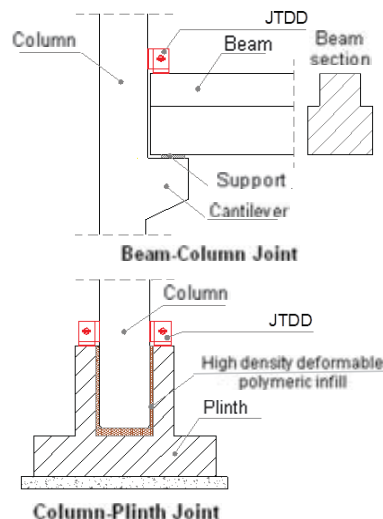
Installation example of the JTDD in the beam-column joint and in the column-plinth joint.
